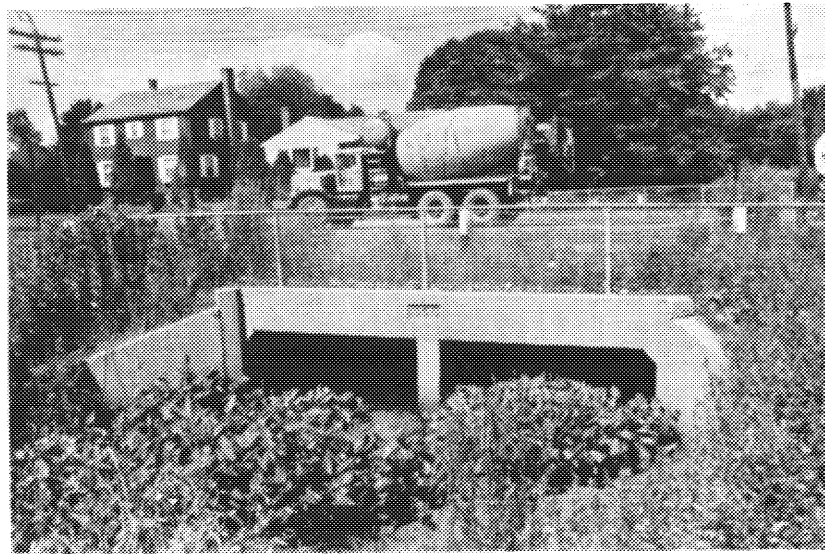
FARM STREET BRIDGE - MILL RIVER
